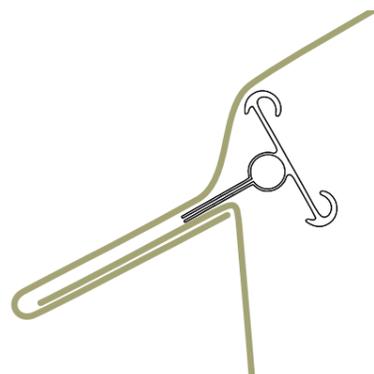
The design of the cover attachment might be in the way to enable a roof overhang.
